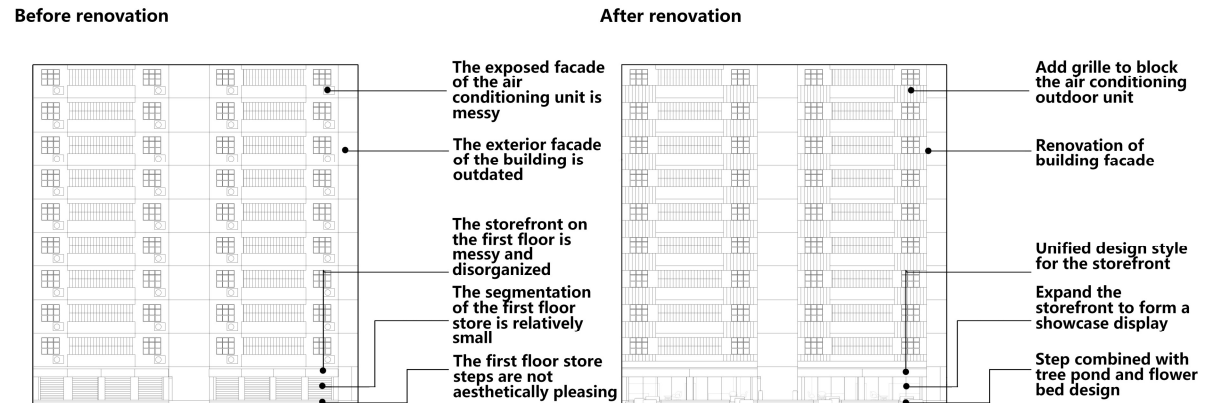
Multi-Story Residential Building Pre - and Post Renovation Elevation
